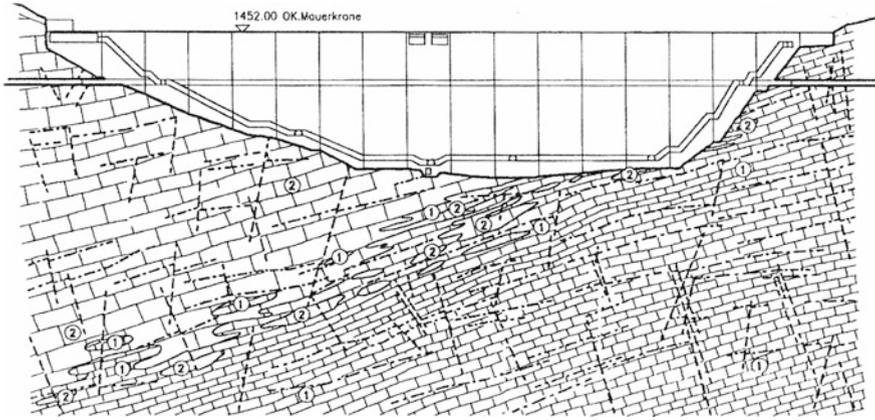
Panix Dam. Stratigraphical units („Quintnerkalk“, „Korallenkalk“)
